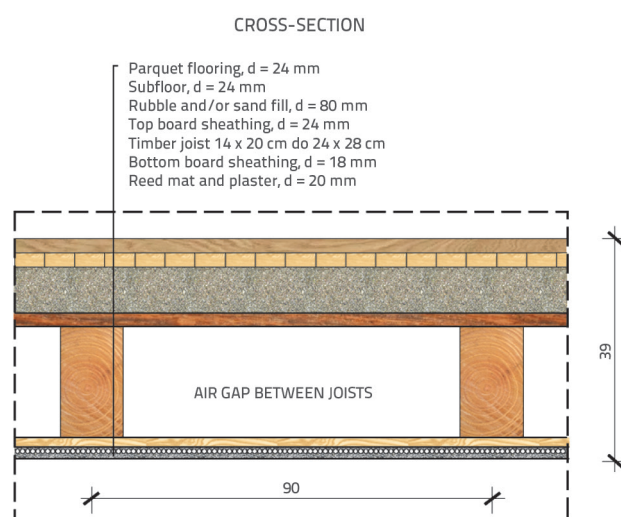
Cross-section of a floor structure with traditional timber beams without recessed infill
